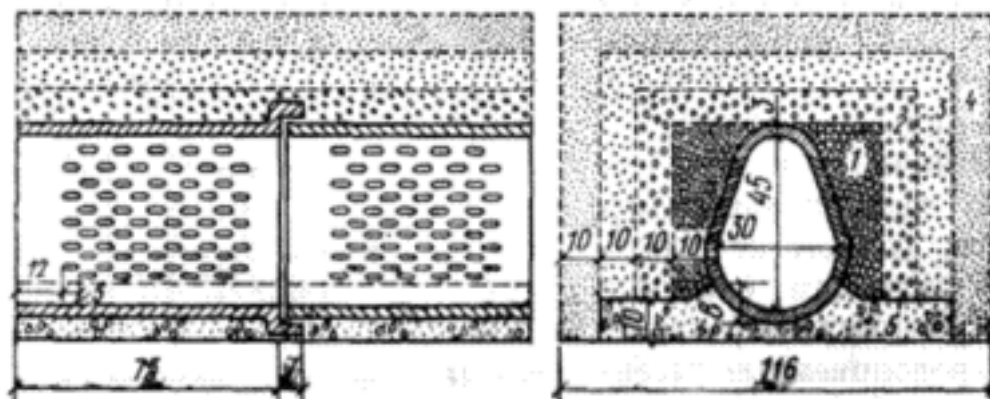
Horizontal water intake from reinforced concrete pipes of ovoid cross-section:
